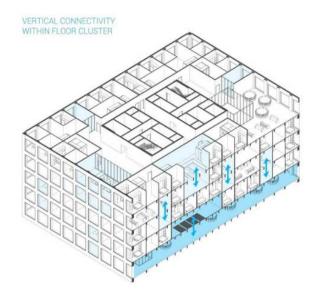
MOR project typical central core structure and open floor plan (MOR).
